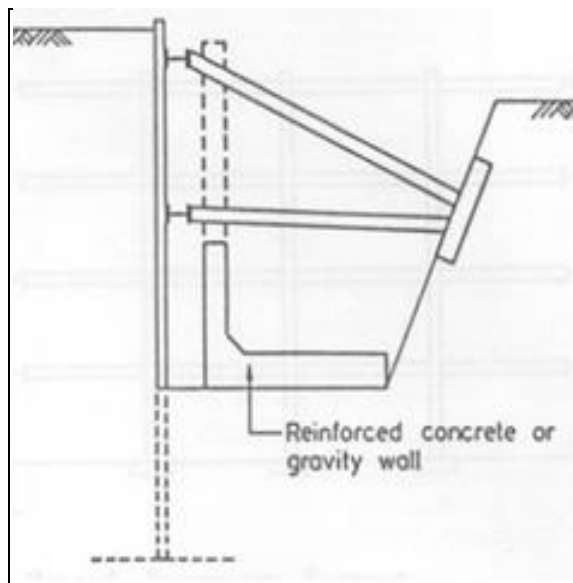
Use of a foundation to support the retaining wall in a narrow staged cutting and two level temporary bracing [2]
